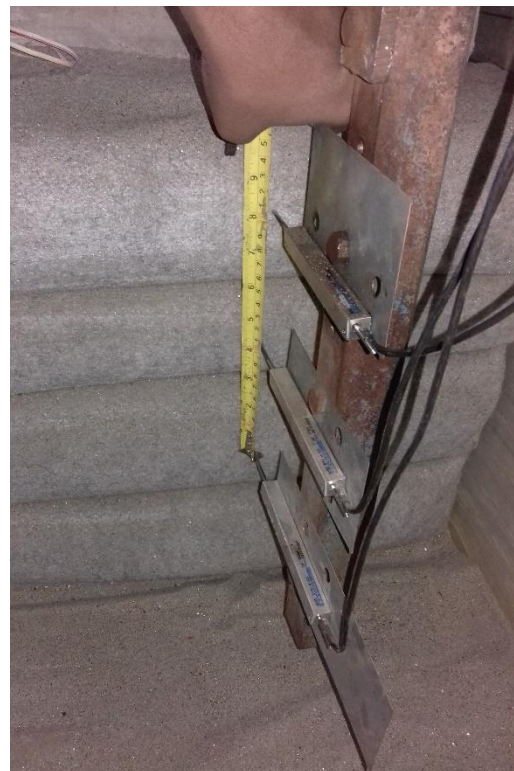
Attachment of measuring tape with the Wrap-faced Retaining wall
